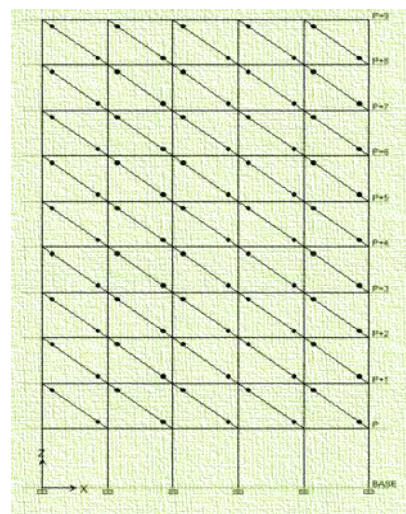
OPEN GROUND STOREY FRAME (M-3)
